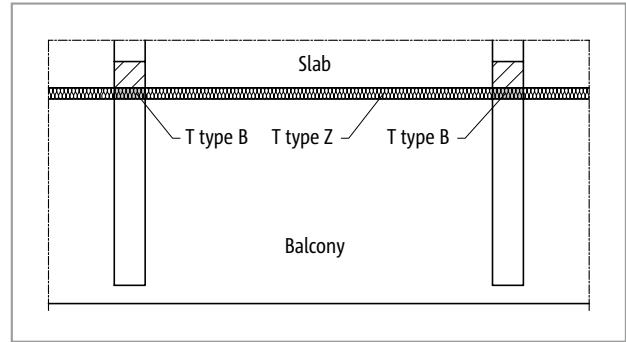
Schöck Isokorb® T type B: Balcony structure with freely cantilevered downstand beams (precast balcony)
